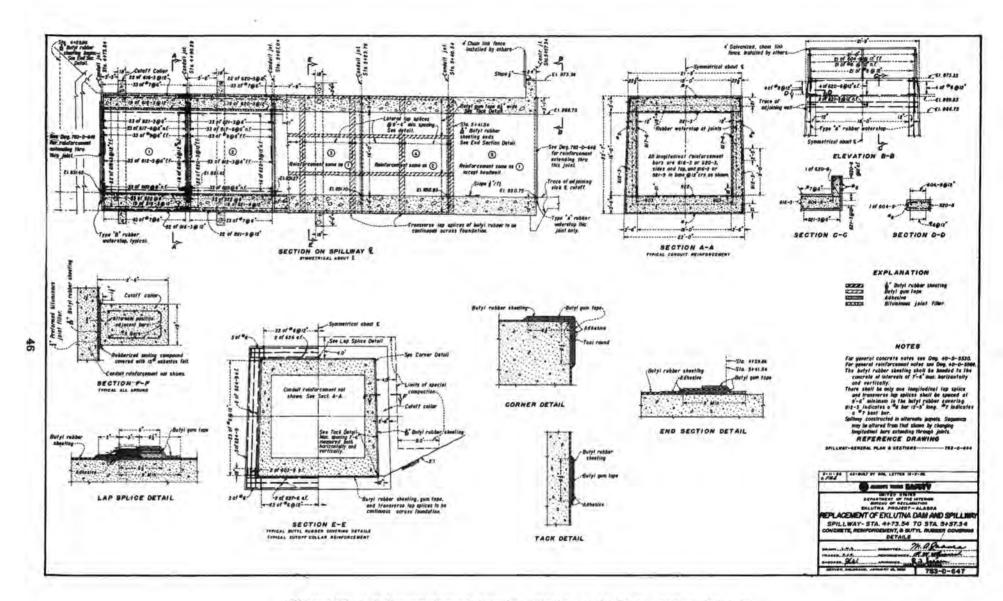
Spillway design details -- Station 4+73, 54 to station 5+57, 34.
